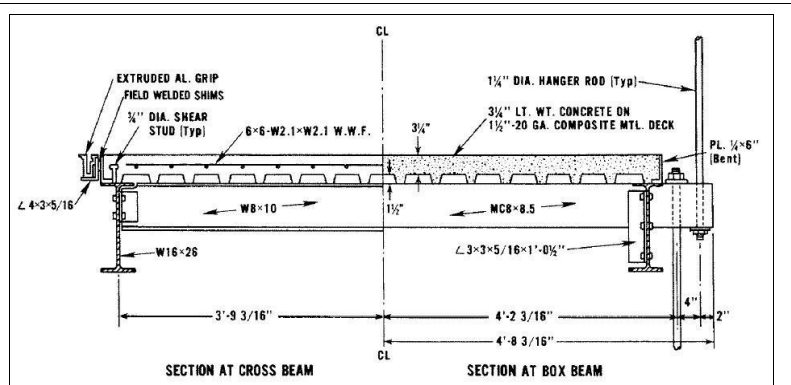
Transverse section of the walkways. On the left side is represented the first design; on the right side is represented the second design, which was built. (Source: [33]).
